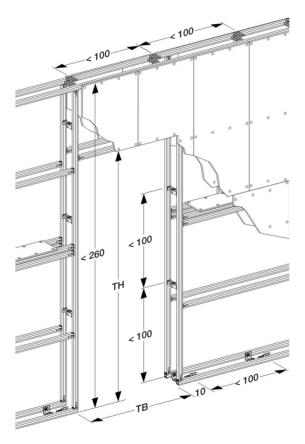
TH Door height 188.5–205.0 cm from the upper edge of the finished floor level TB Door width 63.5 cm, 76 cm, 88.5-115 cm
